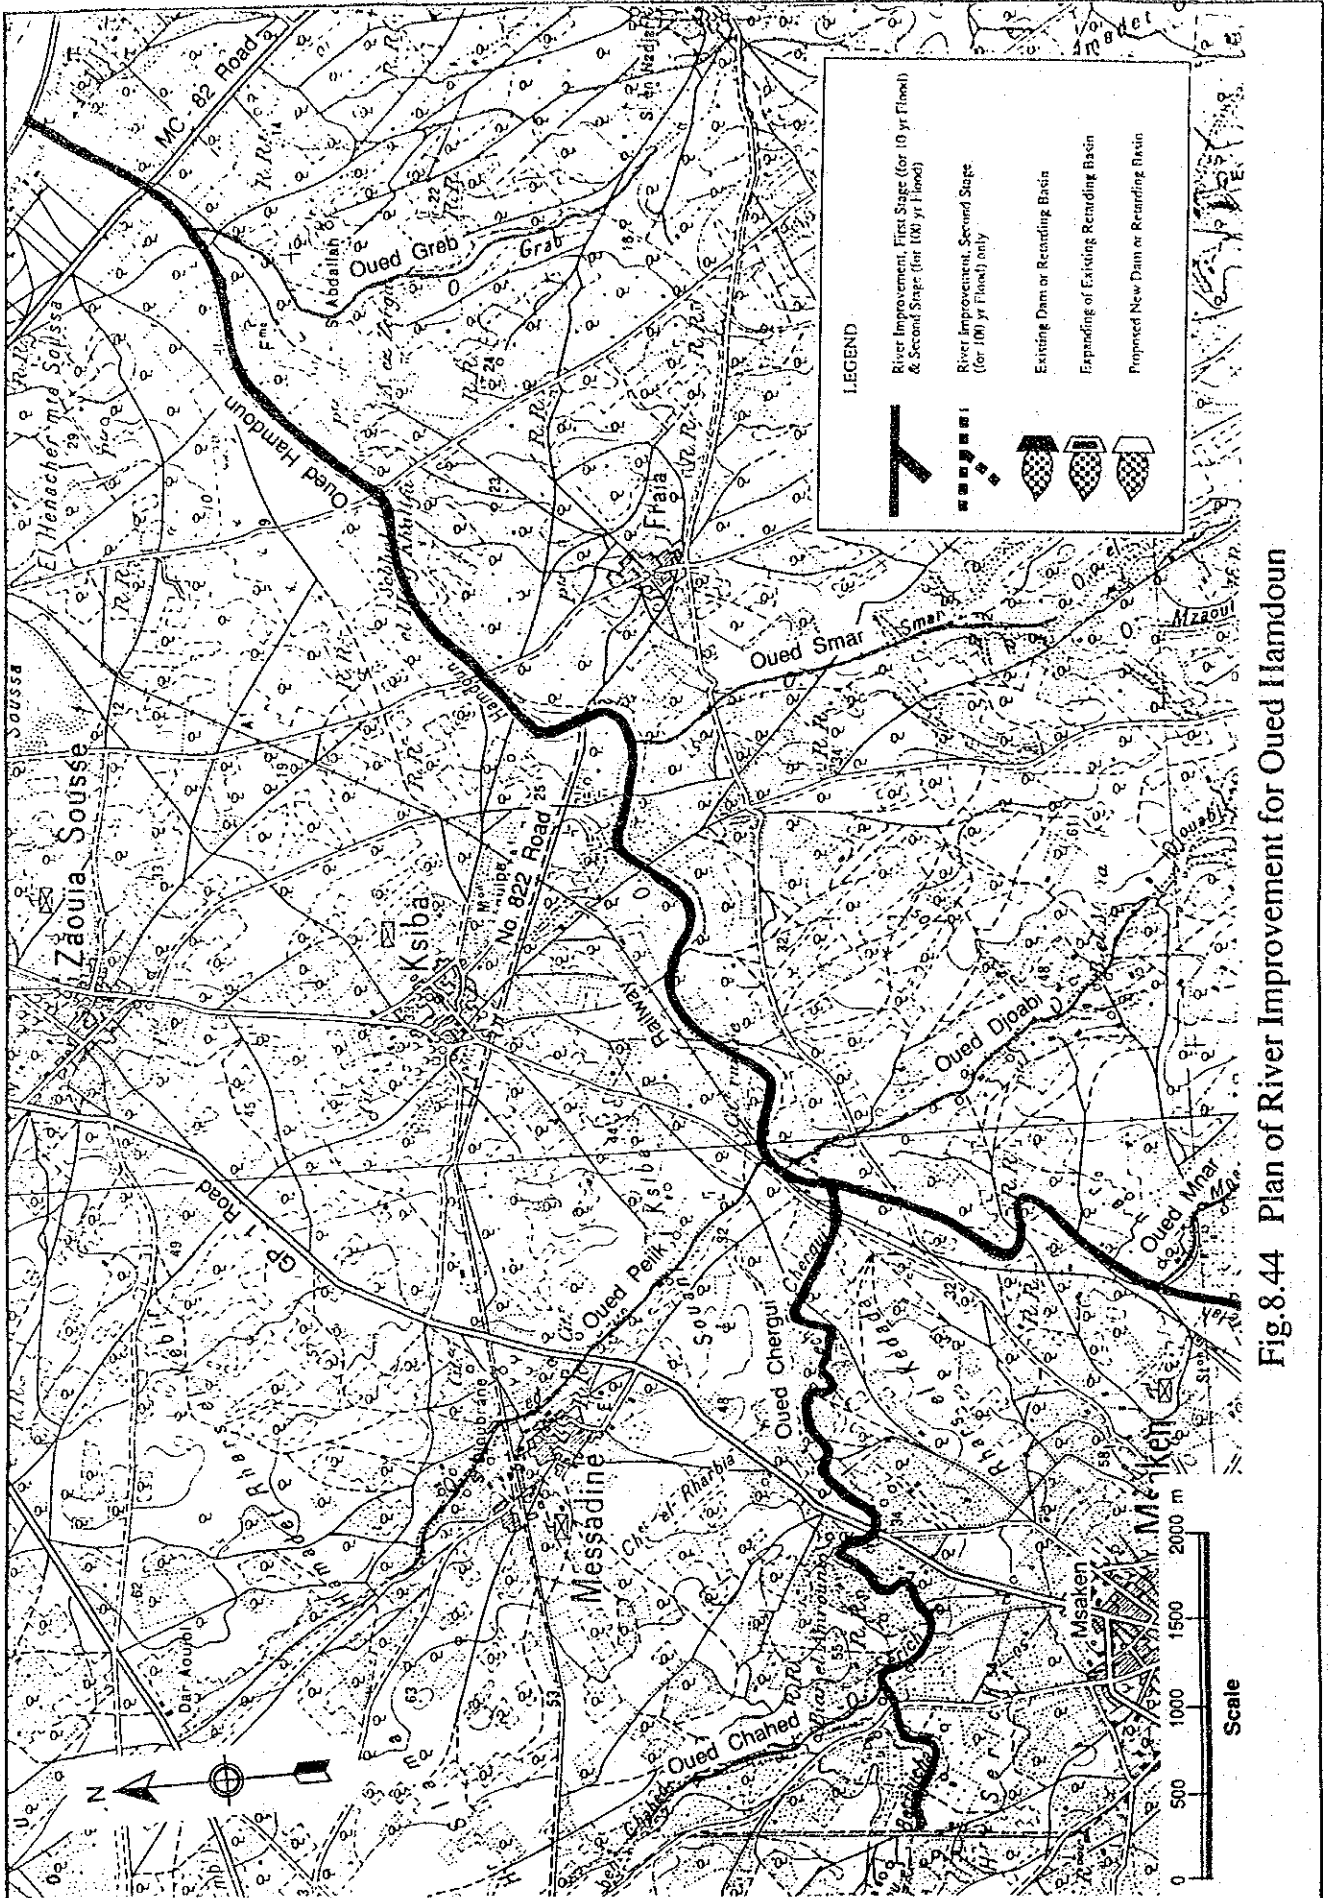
Plan of River Improvement for Oued Hamdoun
